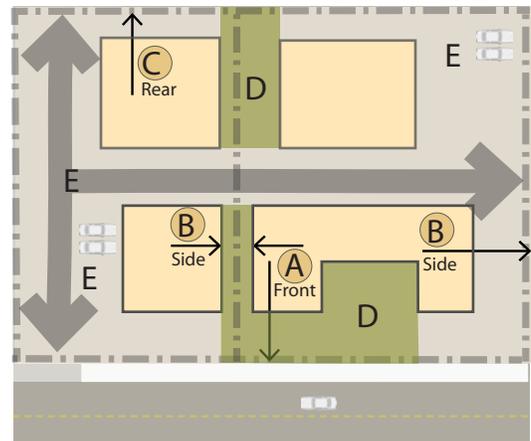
Site design elements for the Mixed Residential Overlay.
